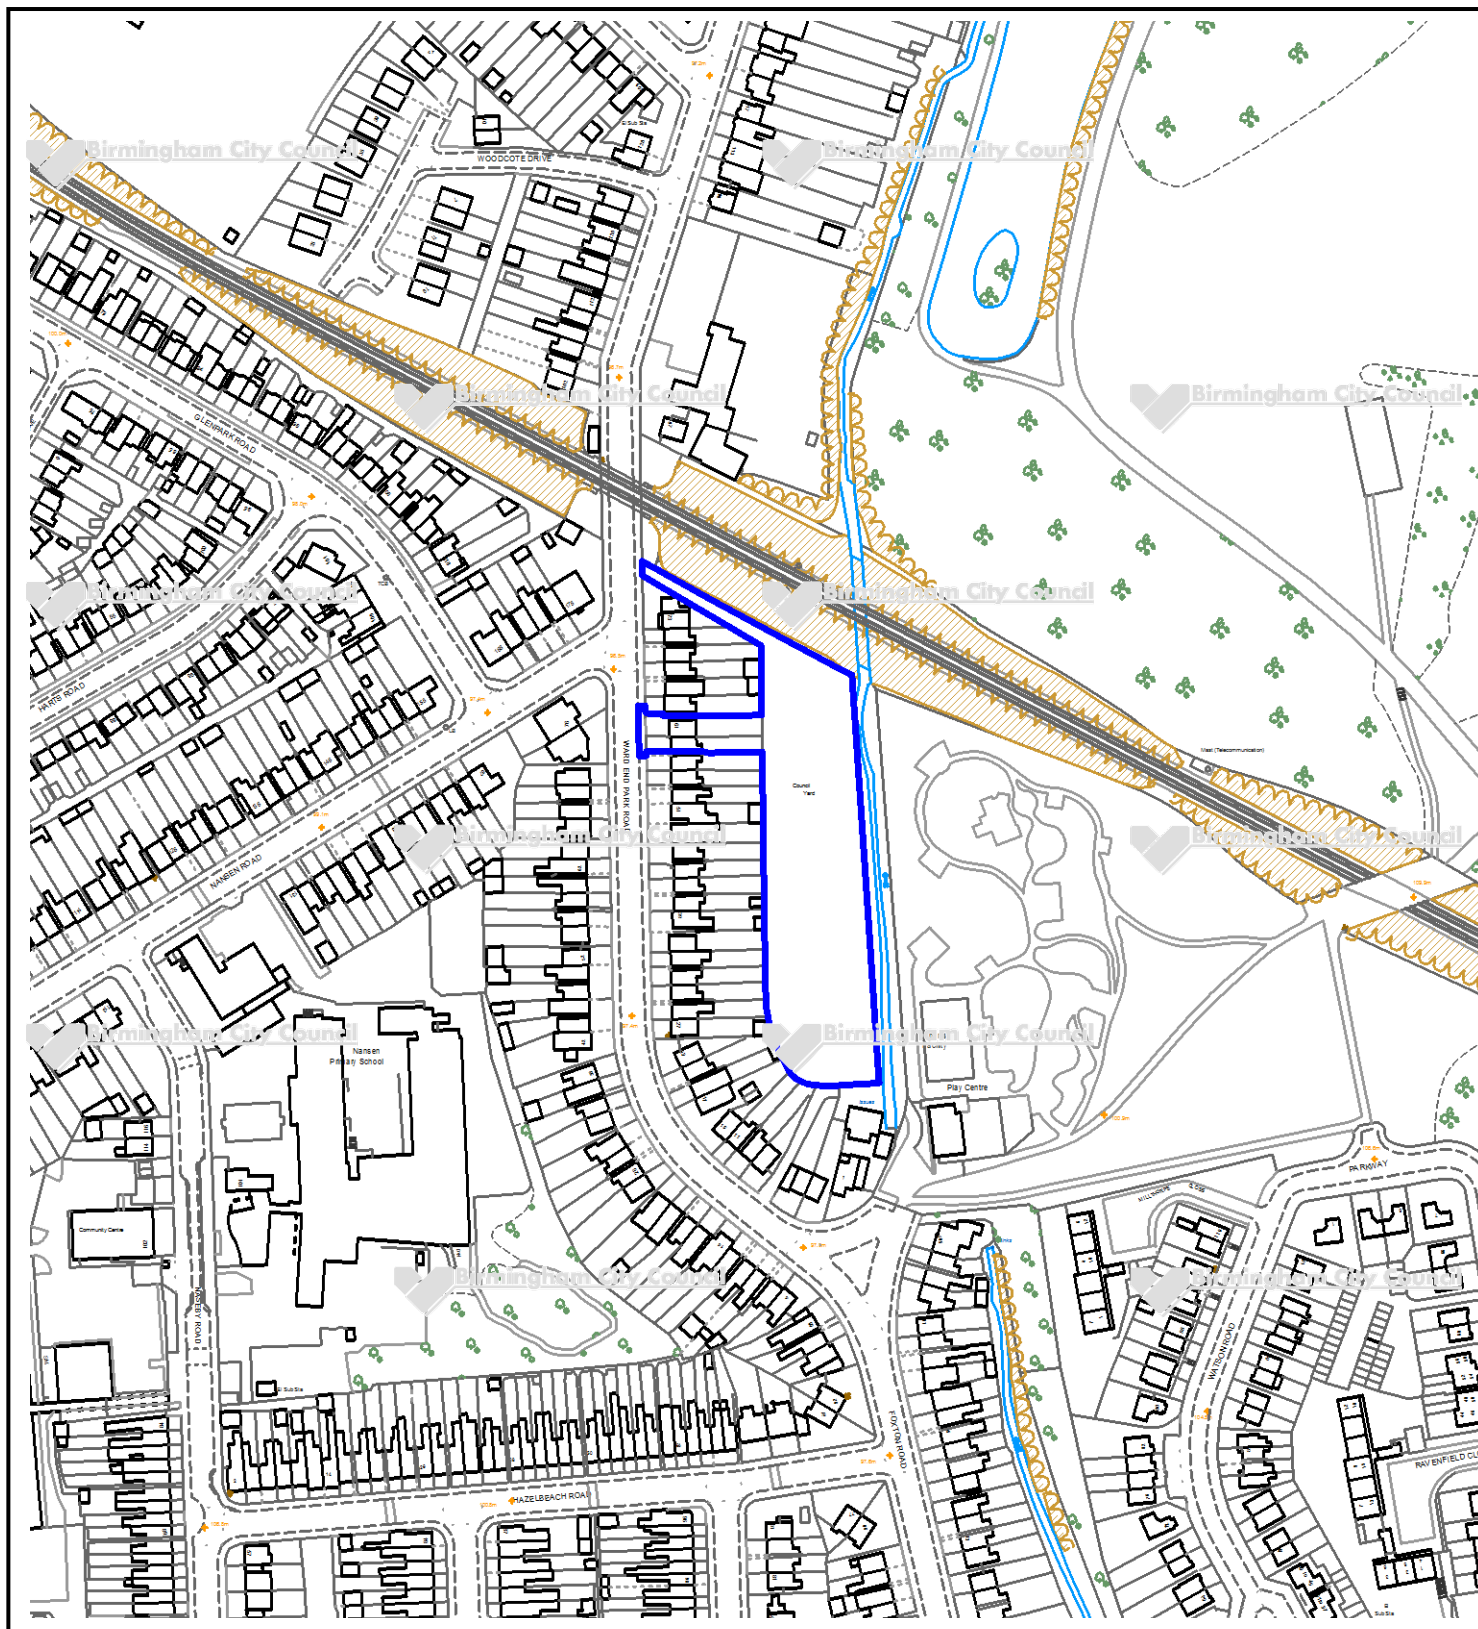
Proposed Access Route, demolition of No 59 and 61 Ward End Park Road
